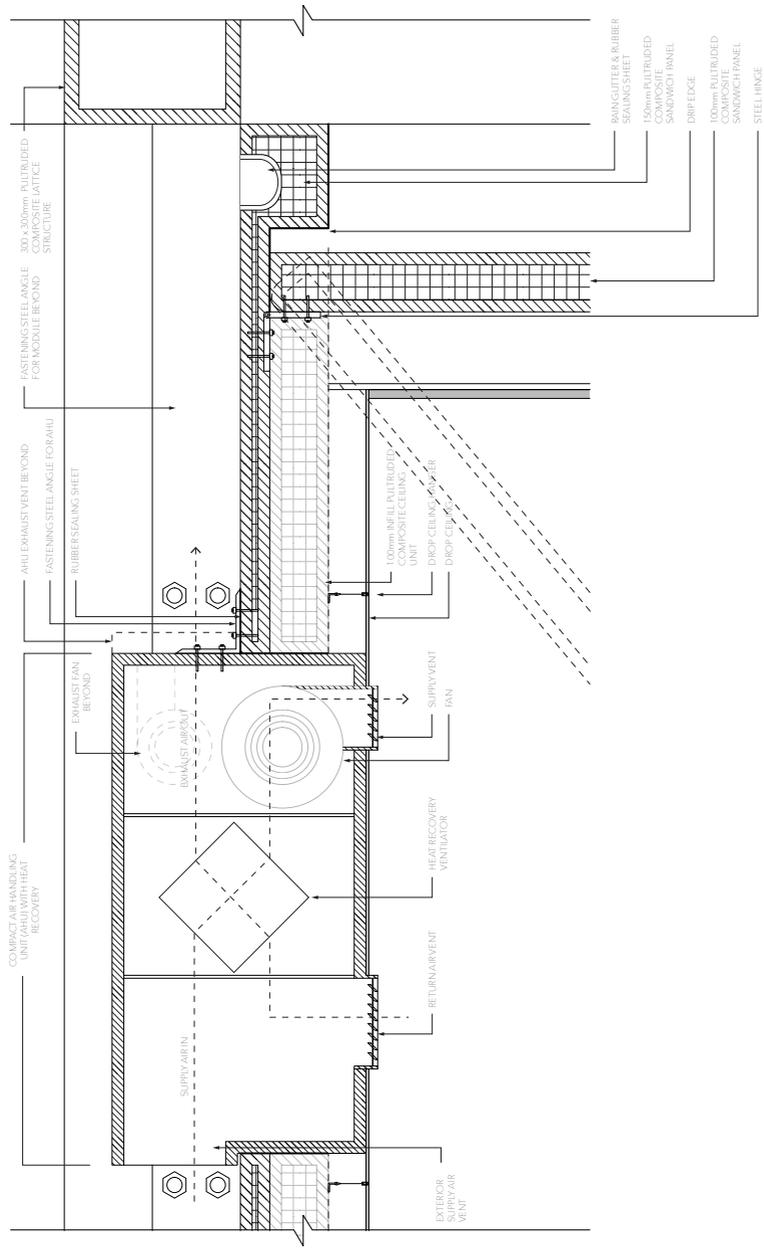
Ceiling Fixed Air Handling Unit with Heat Recovery Detail (NTS)
